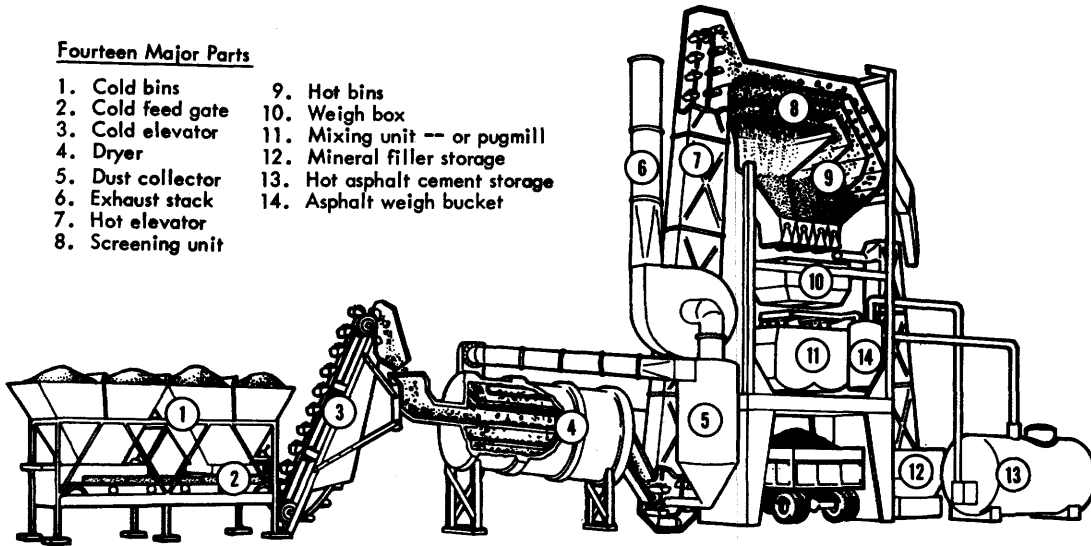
Cutaway View of Typical Batch Plant.
